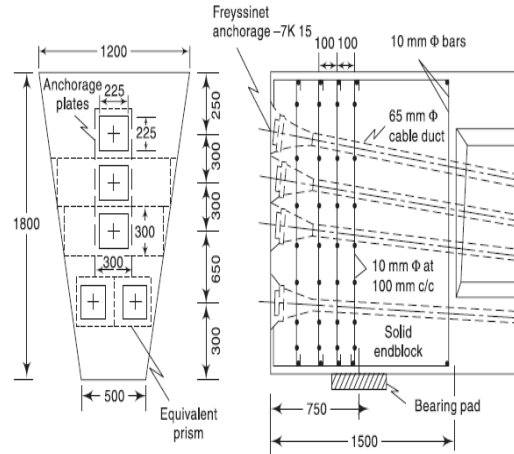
Equivalent prisms and anchorage zone reinforcement
